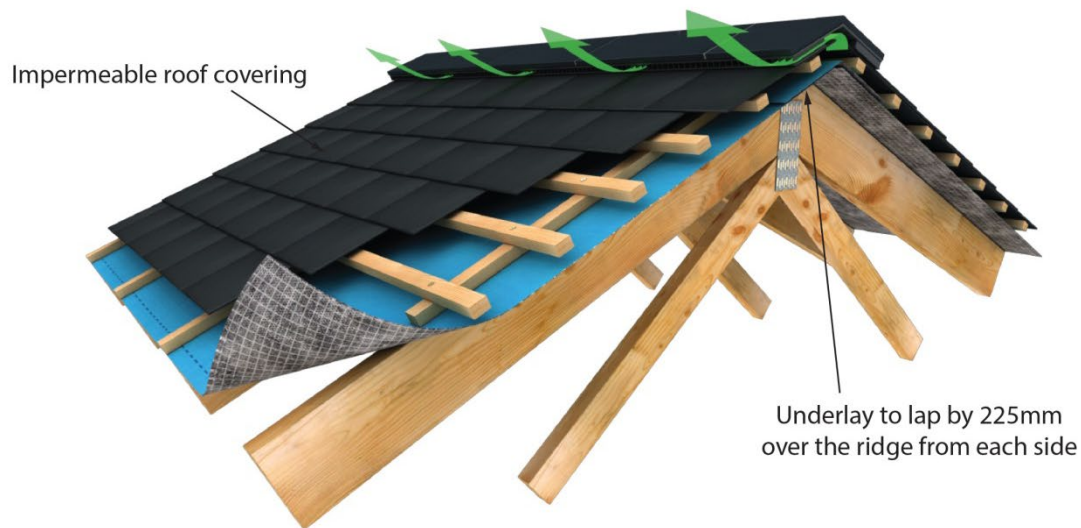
Cold Roof detail with impermeable roof covering - Ridge Detail
